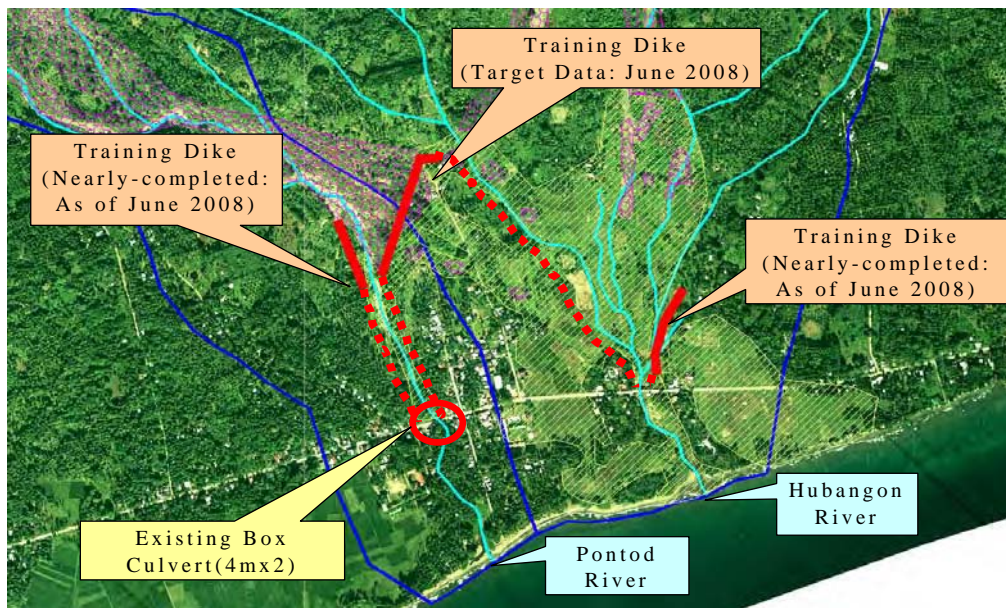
Construction Plan of Training Dike being Constructed by DPWH-DEO
